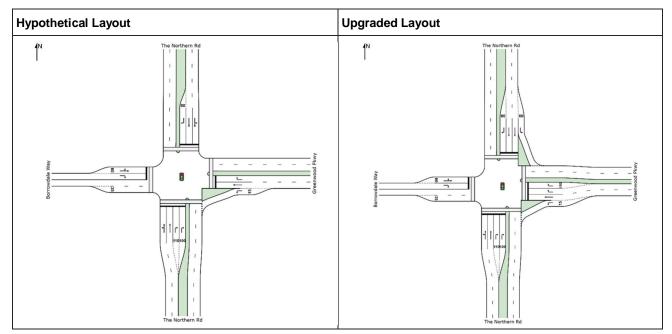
2021 without Links Road extension - The Northern Road/Borrowdale Way/Greenwood Parkway
